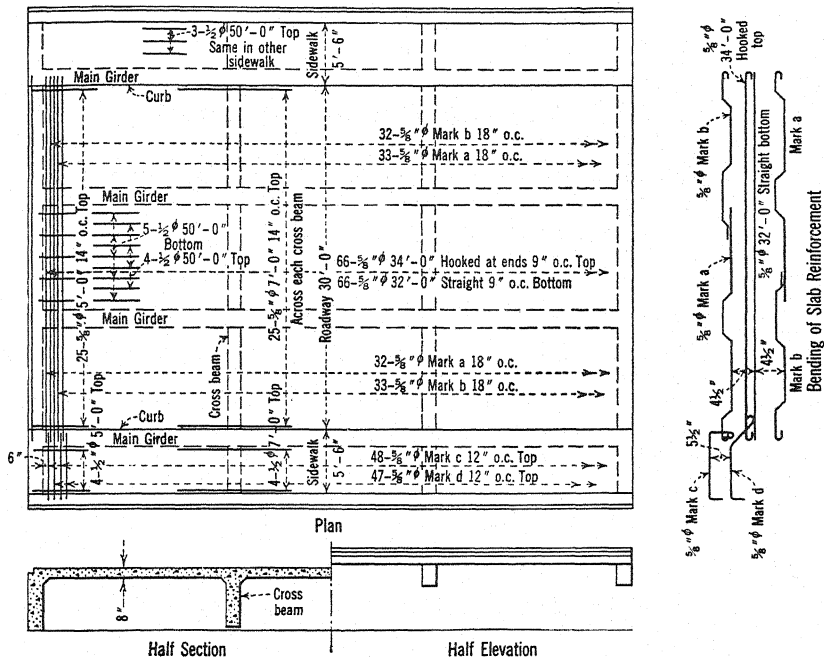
Arrangement of Reinforcement. (See p. 64.)
